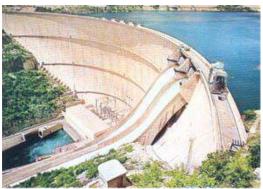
Hydropower plant Trebinje 1 on the river Trebišnjica, 1968.
